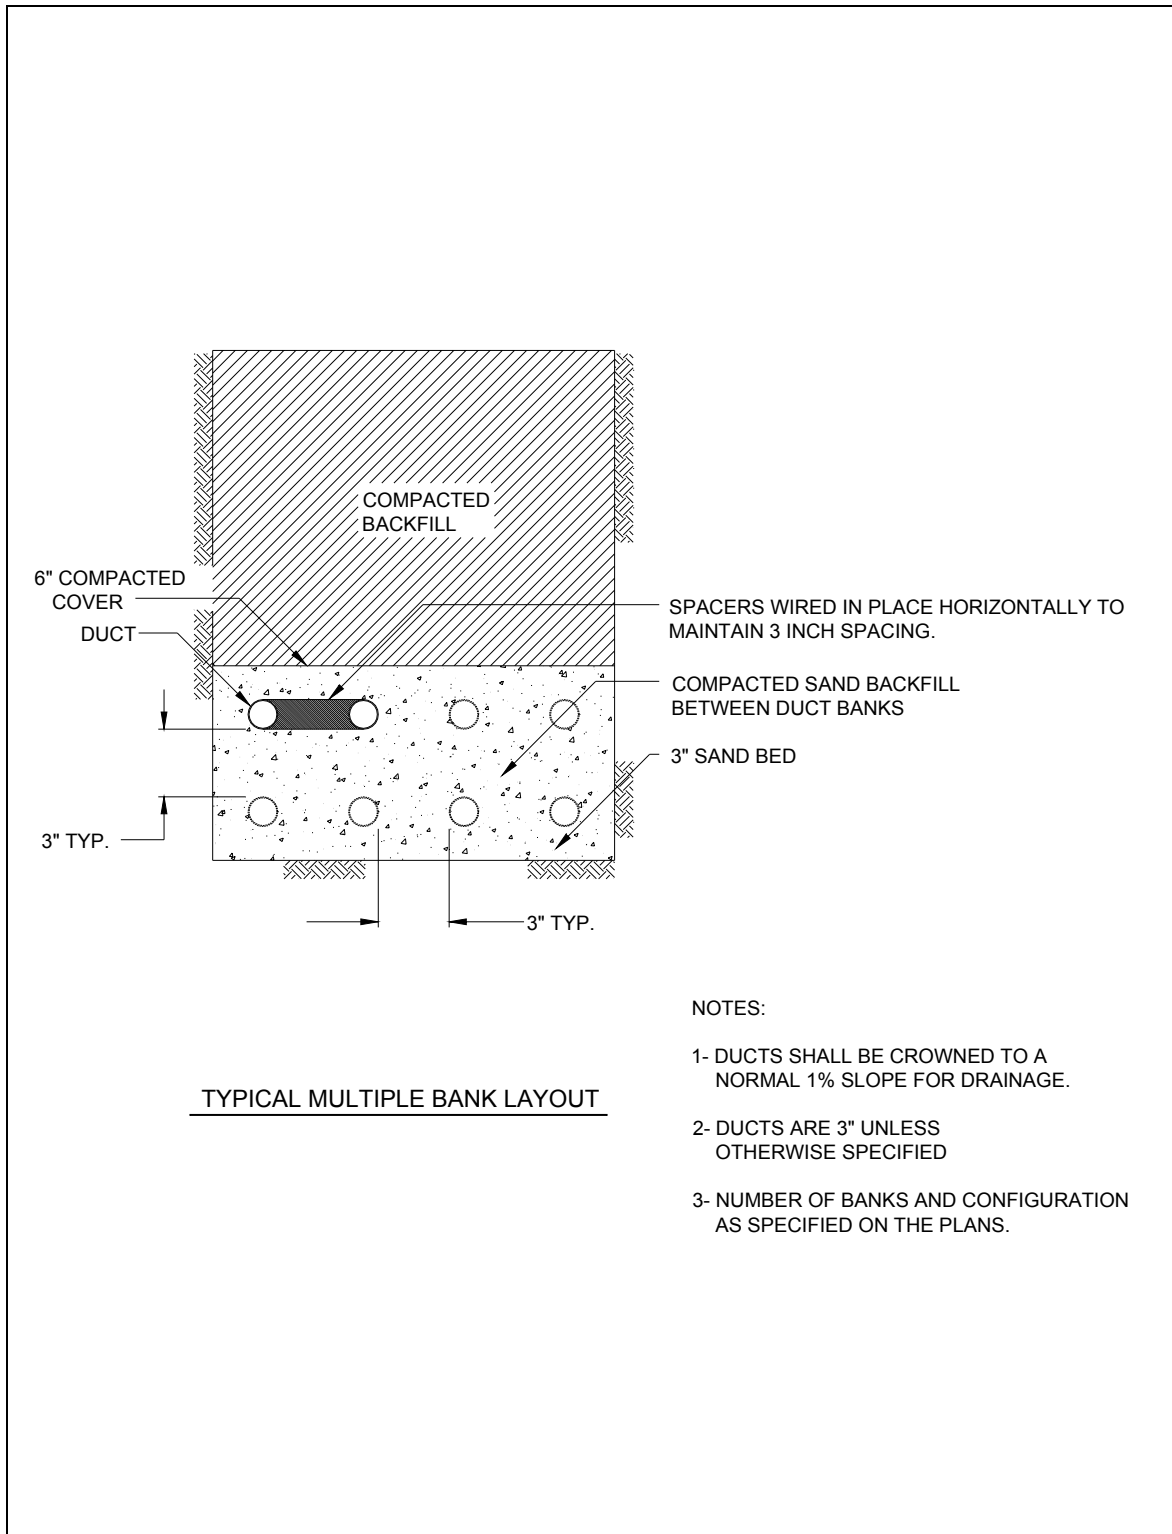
Standard Details for Underground Cable Installation – GL-600 Sheet 2B – Typical Multiple Bank Layout
